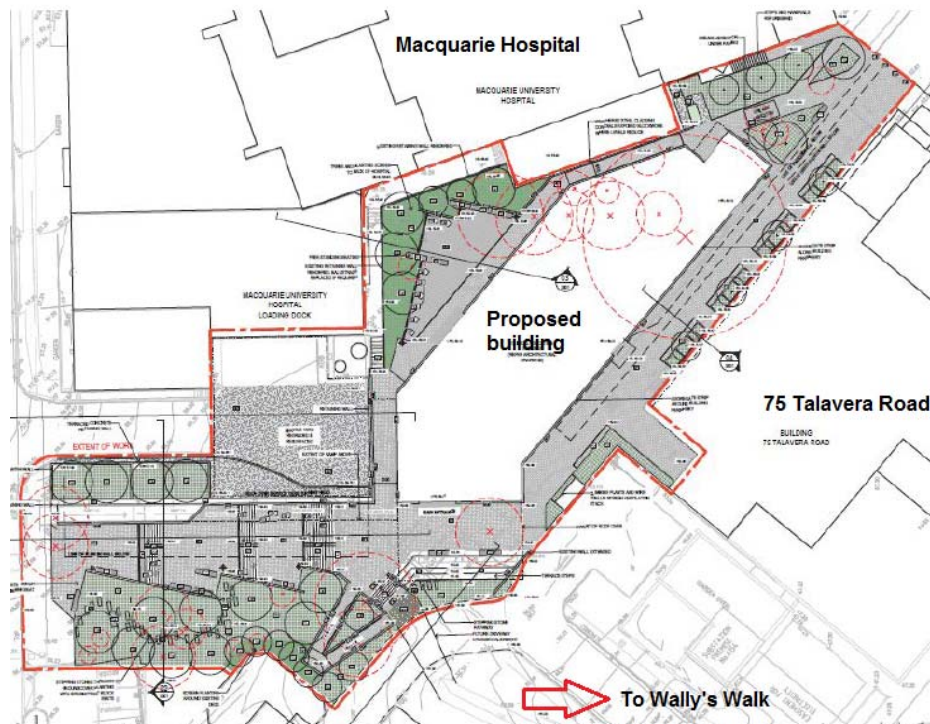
Location of the proposed building in relation to the surrounding buildings.
